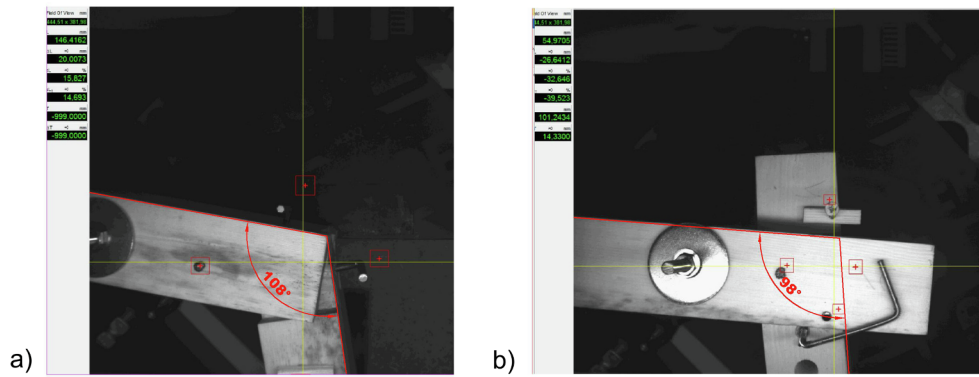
Top view on deformed joints: (a) dovetail joint and (b) saddle-notch joint.
